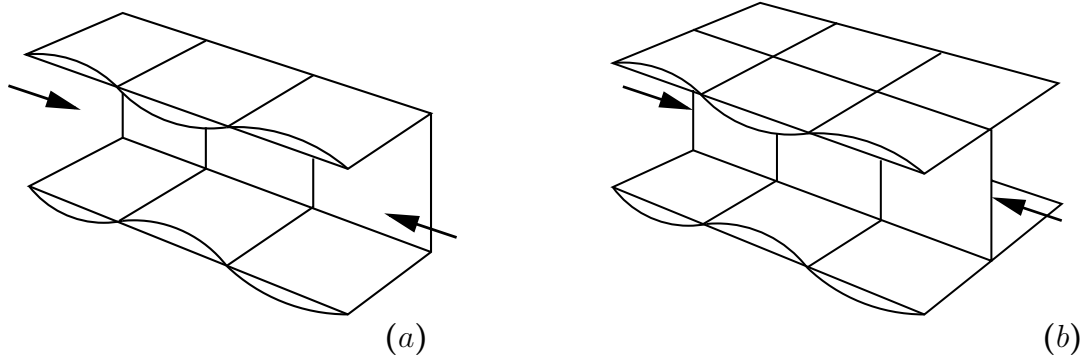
Local buckling of the flange outstand of a beam with (a) a channel section profile and (b) a T-section profile.
